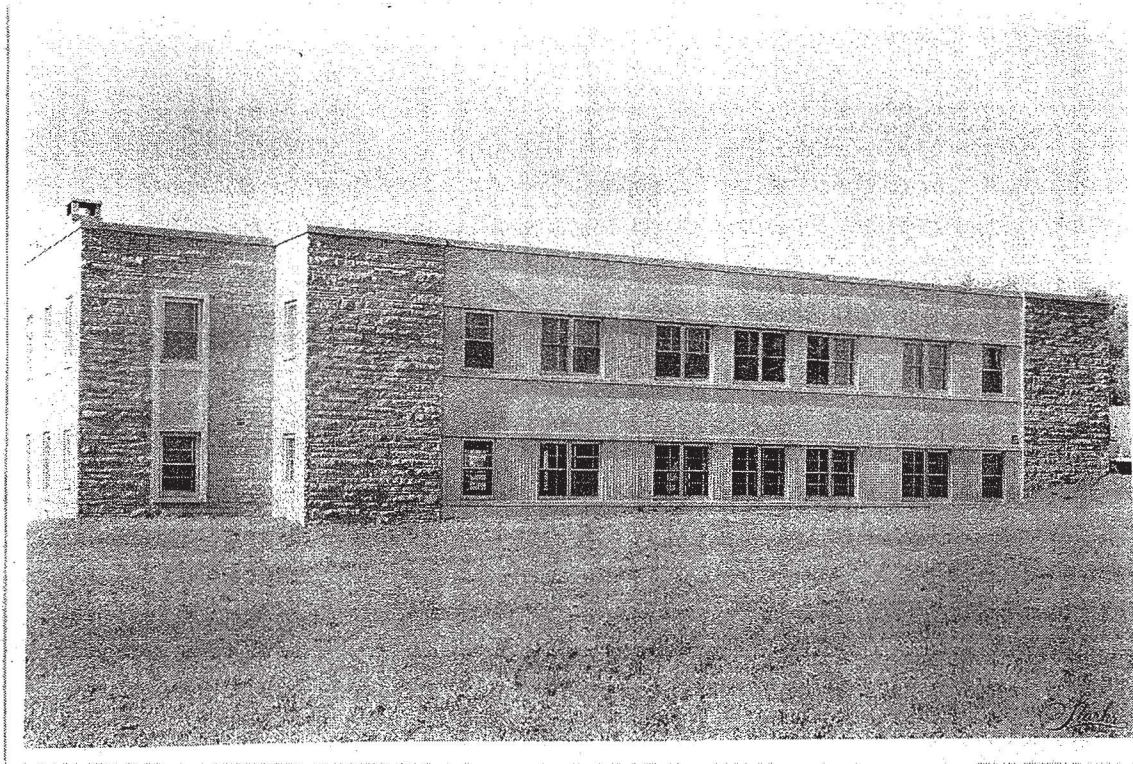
Exterior south elevation of administration building showing display of stone finishes.
